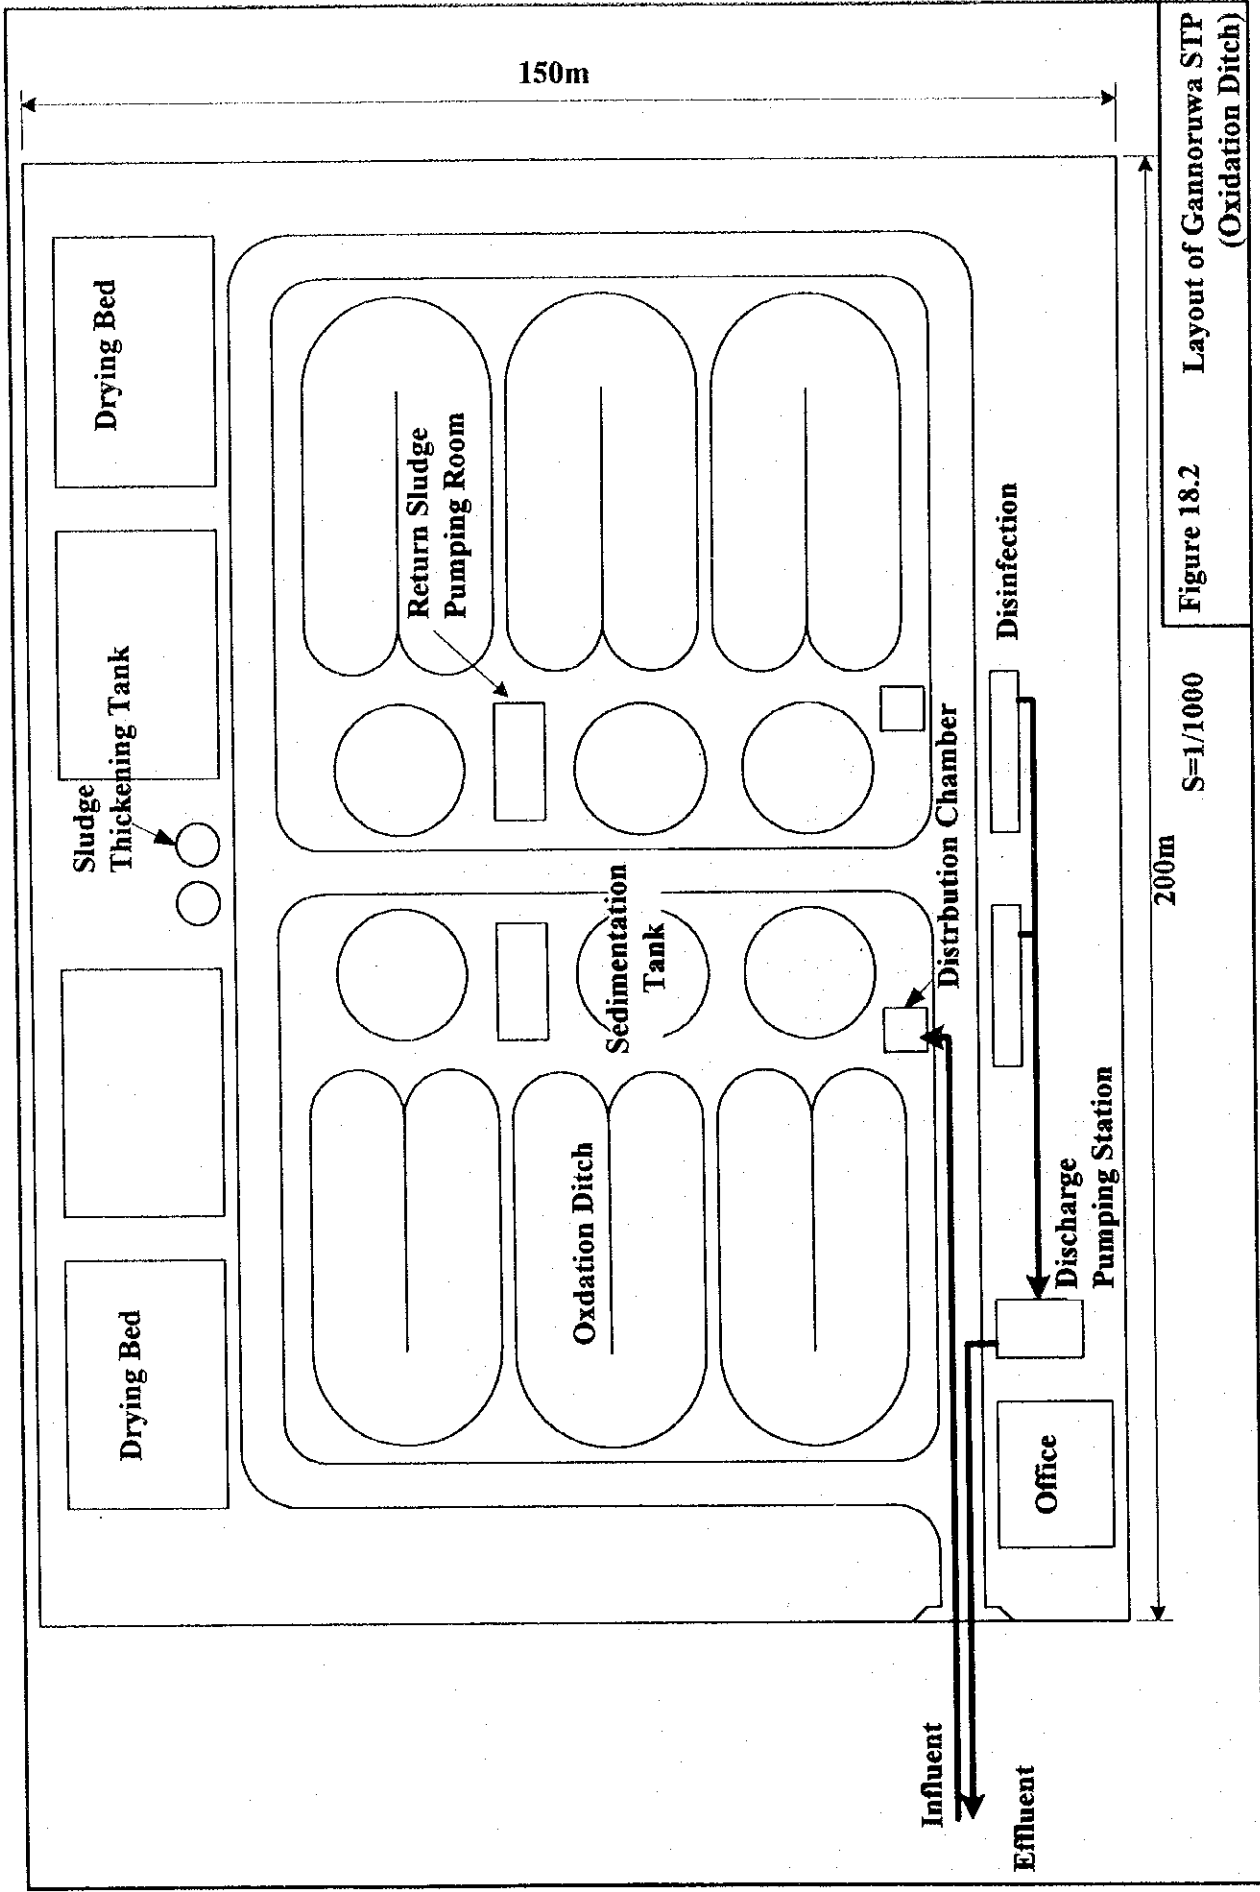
Layout of Gannoruwa STP (Oxidation Ditch)
